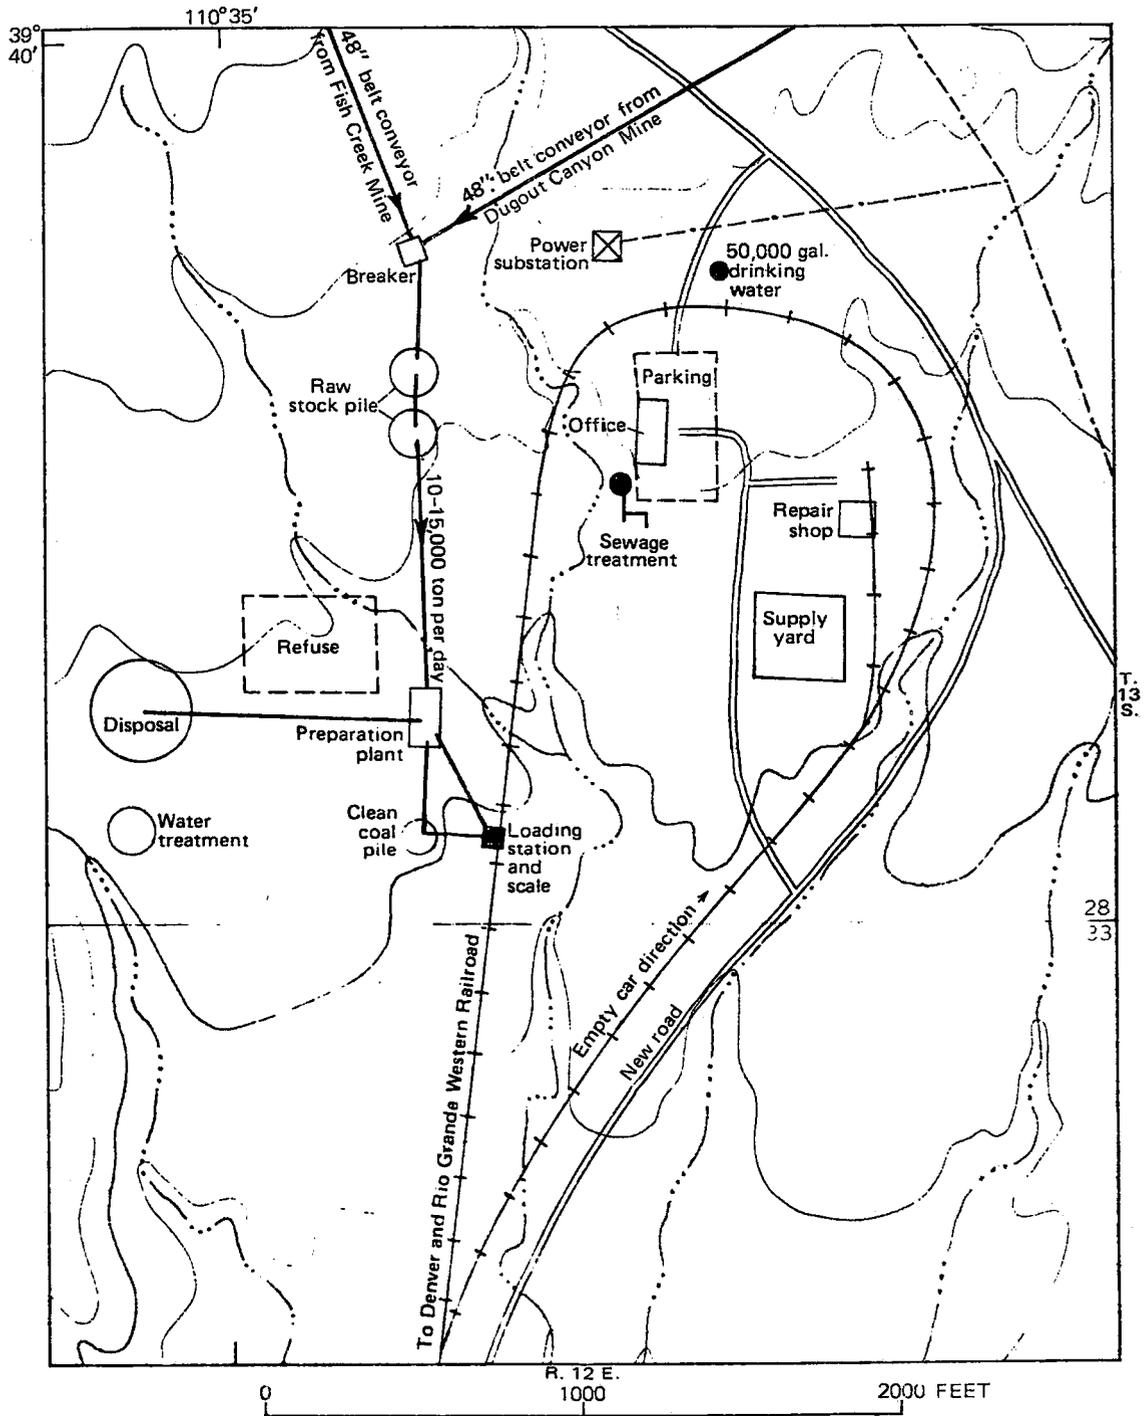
Proposed layout of the surface facilities at the central yardsite for the Fish Creek and Dugout Canyon mines, Carbon County, Utah.
